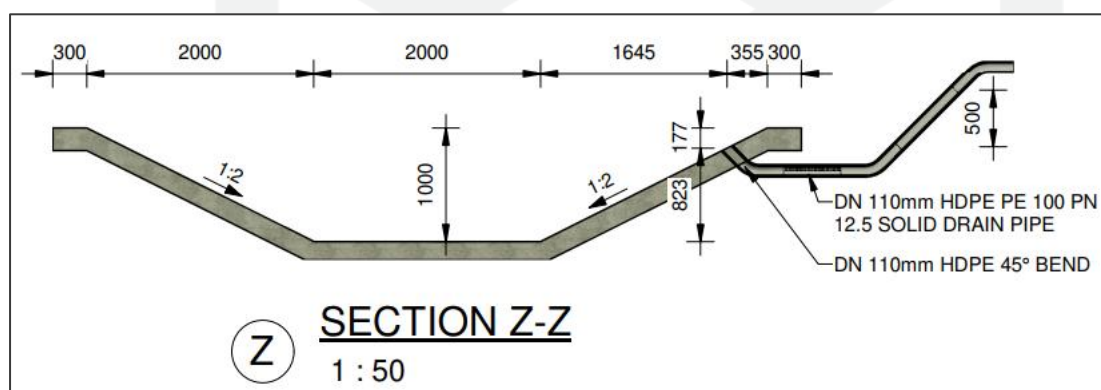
Typical Trapezoidal Concrete-lined Channel Detail
